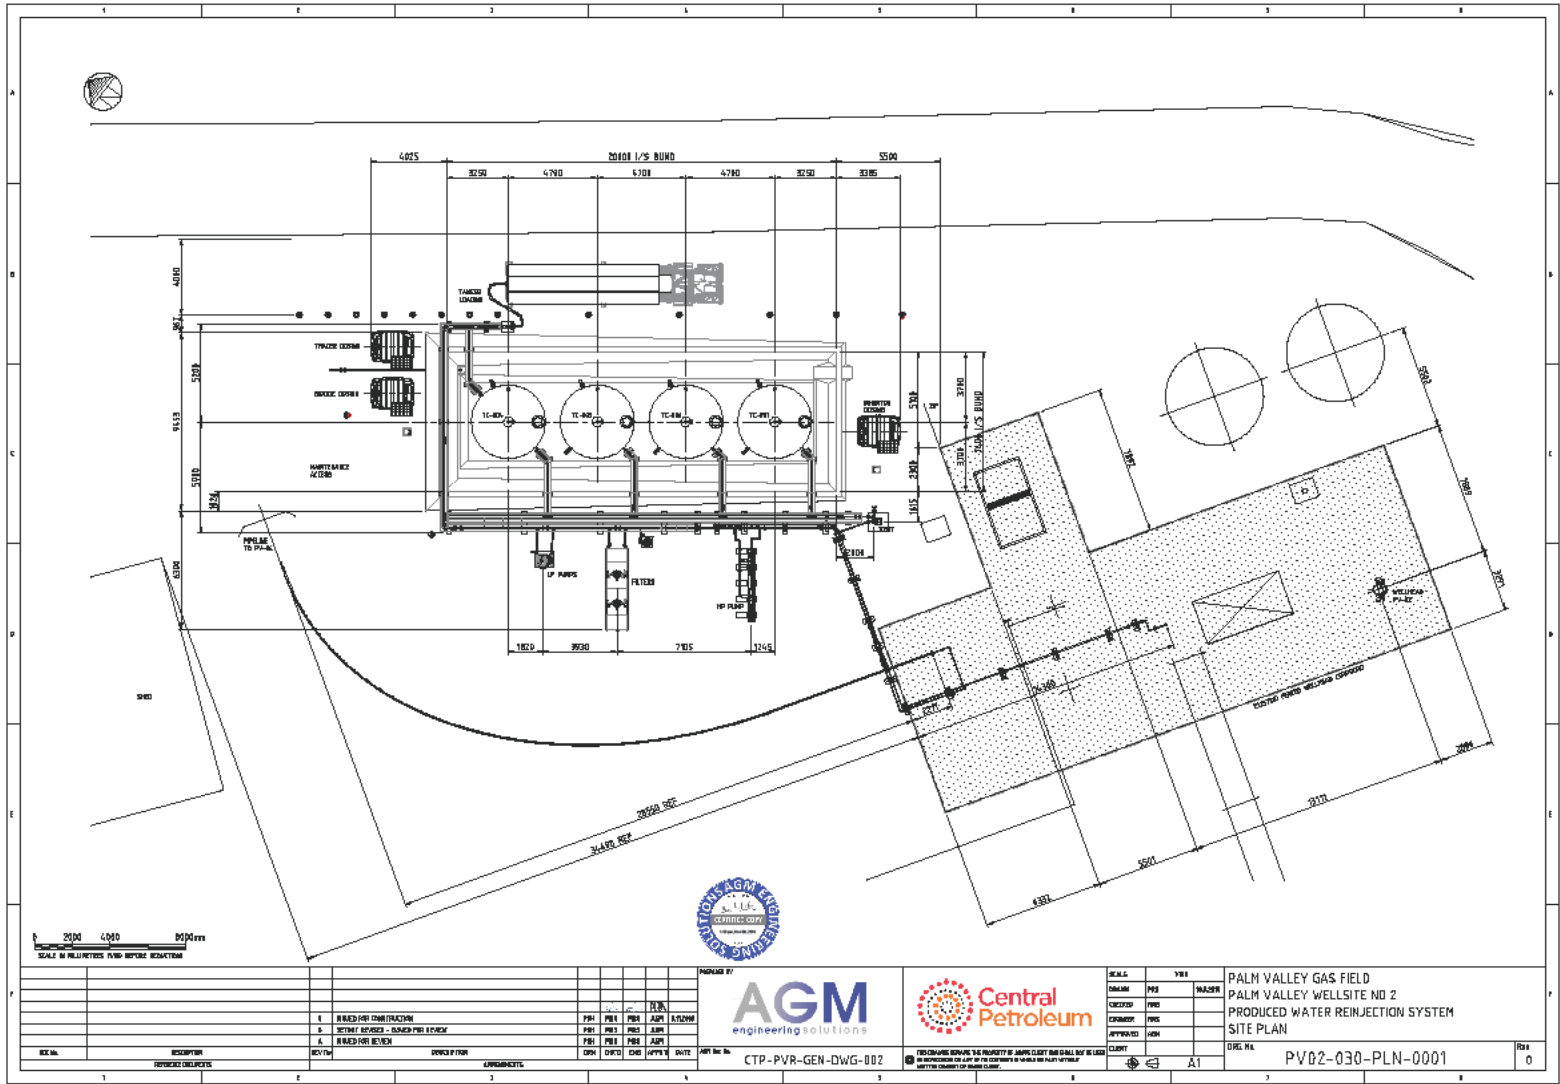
New reinjection system infrastructure adjacent to PV-02
